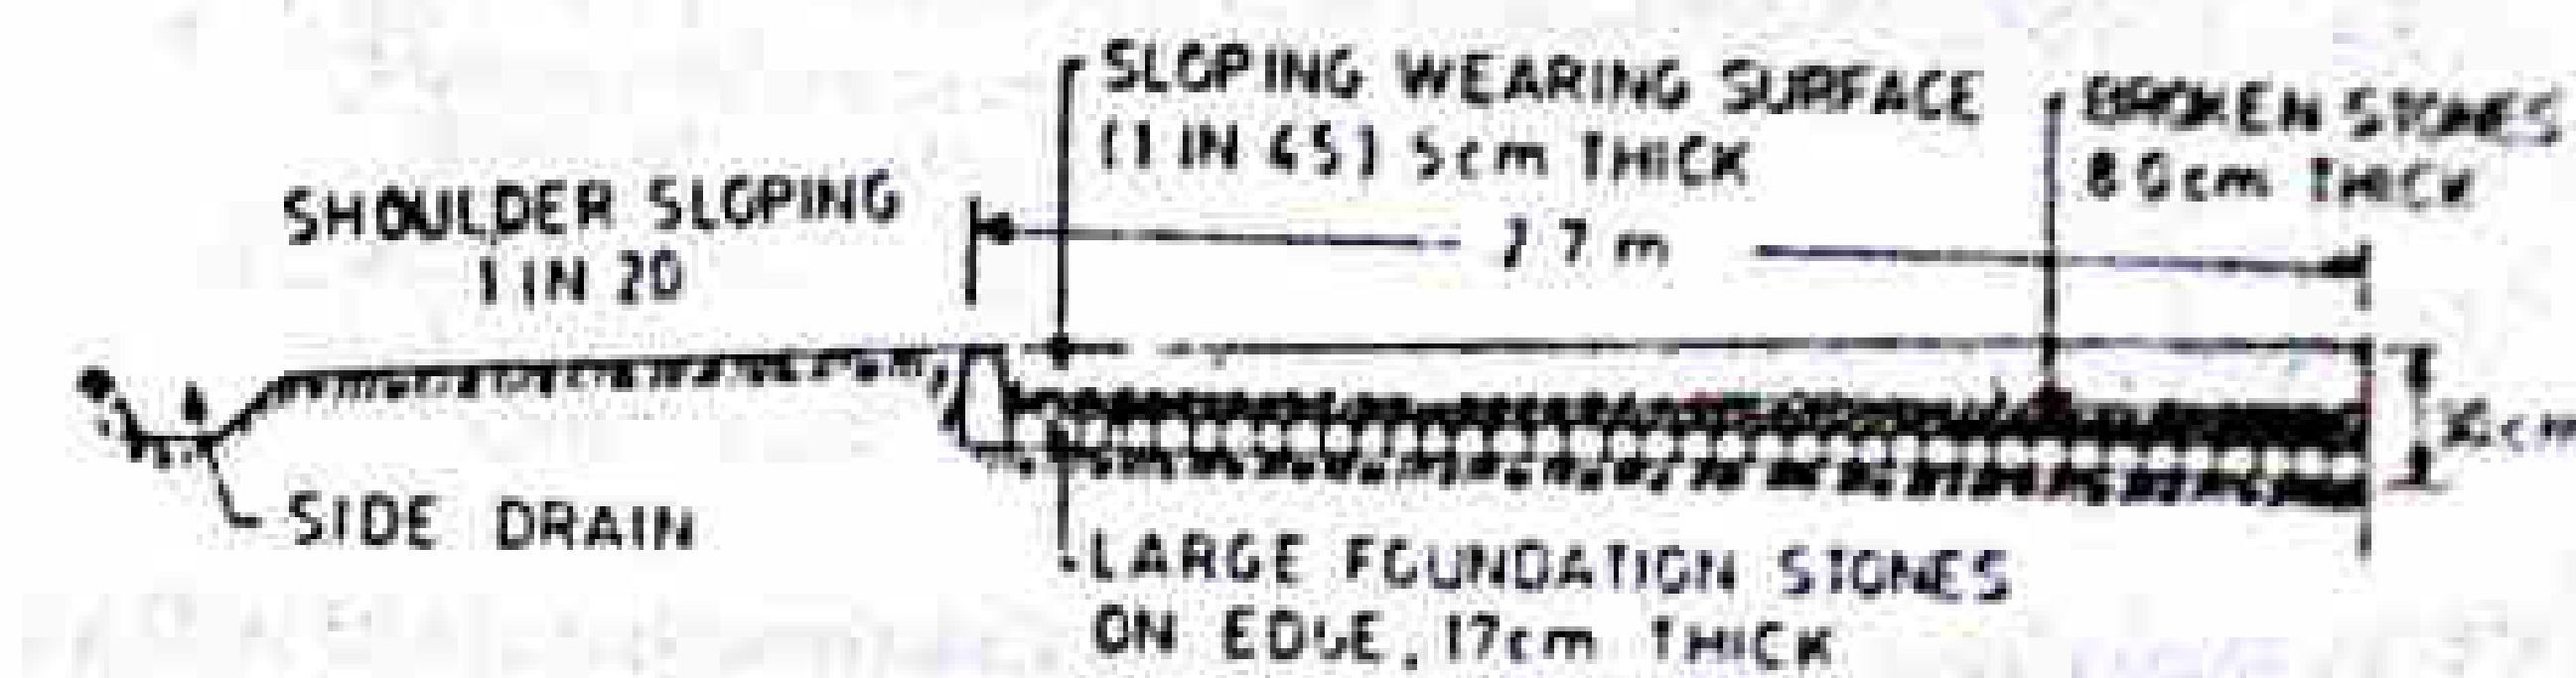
Typical Cross Section of Tresaguet's Construction (1775 A.D.)
